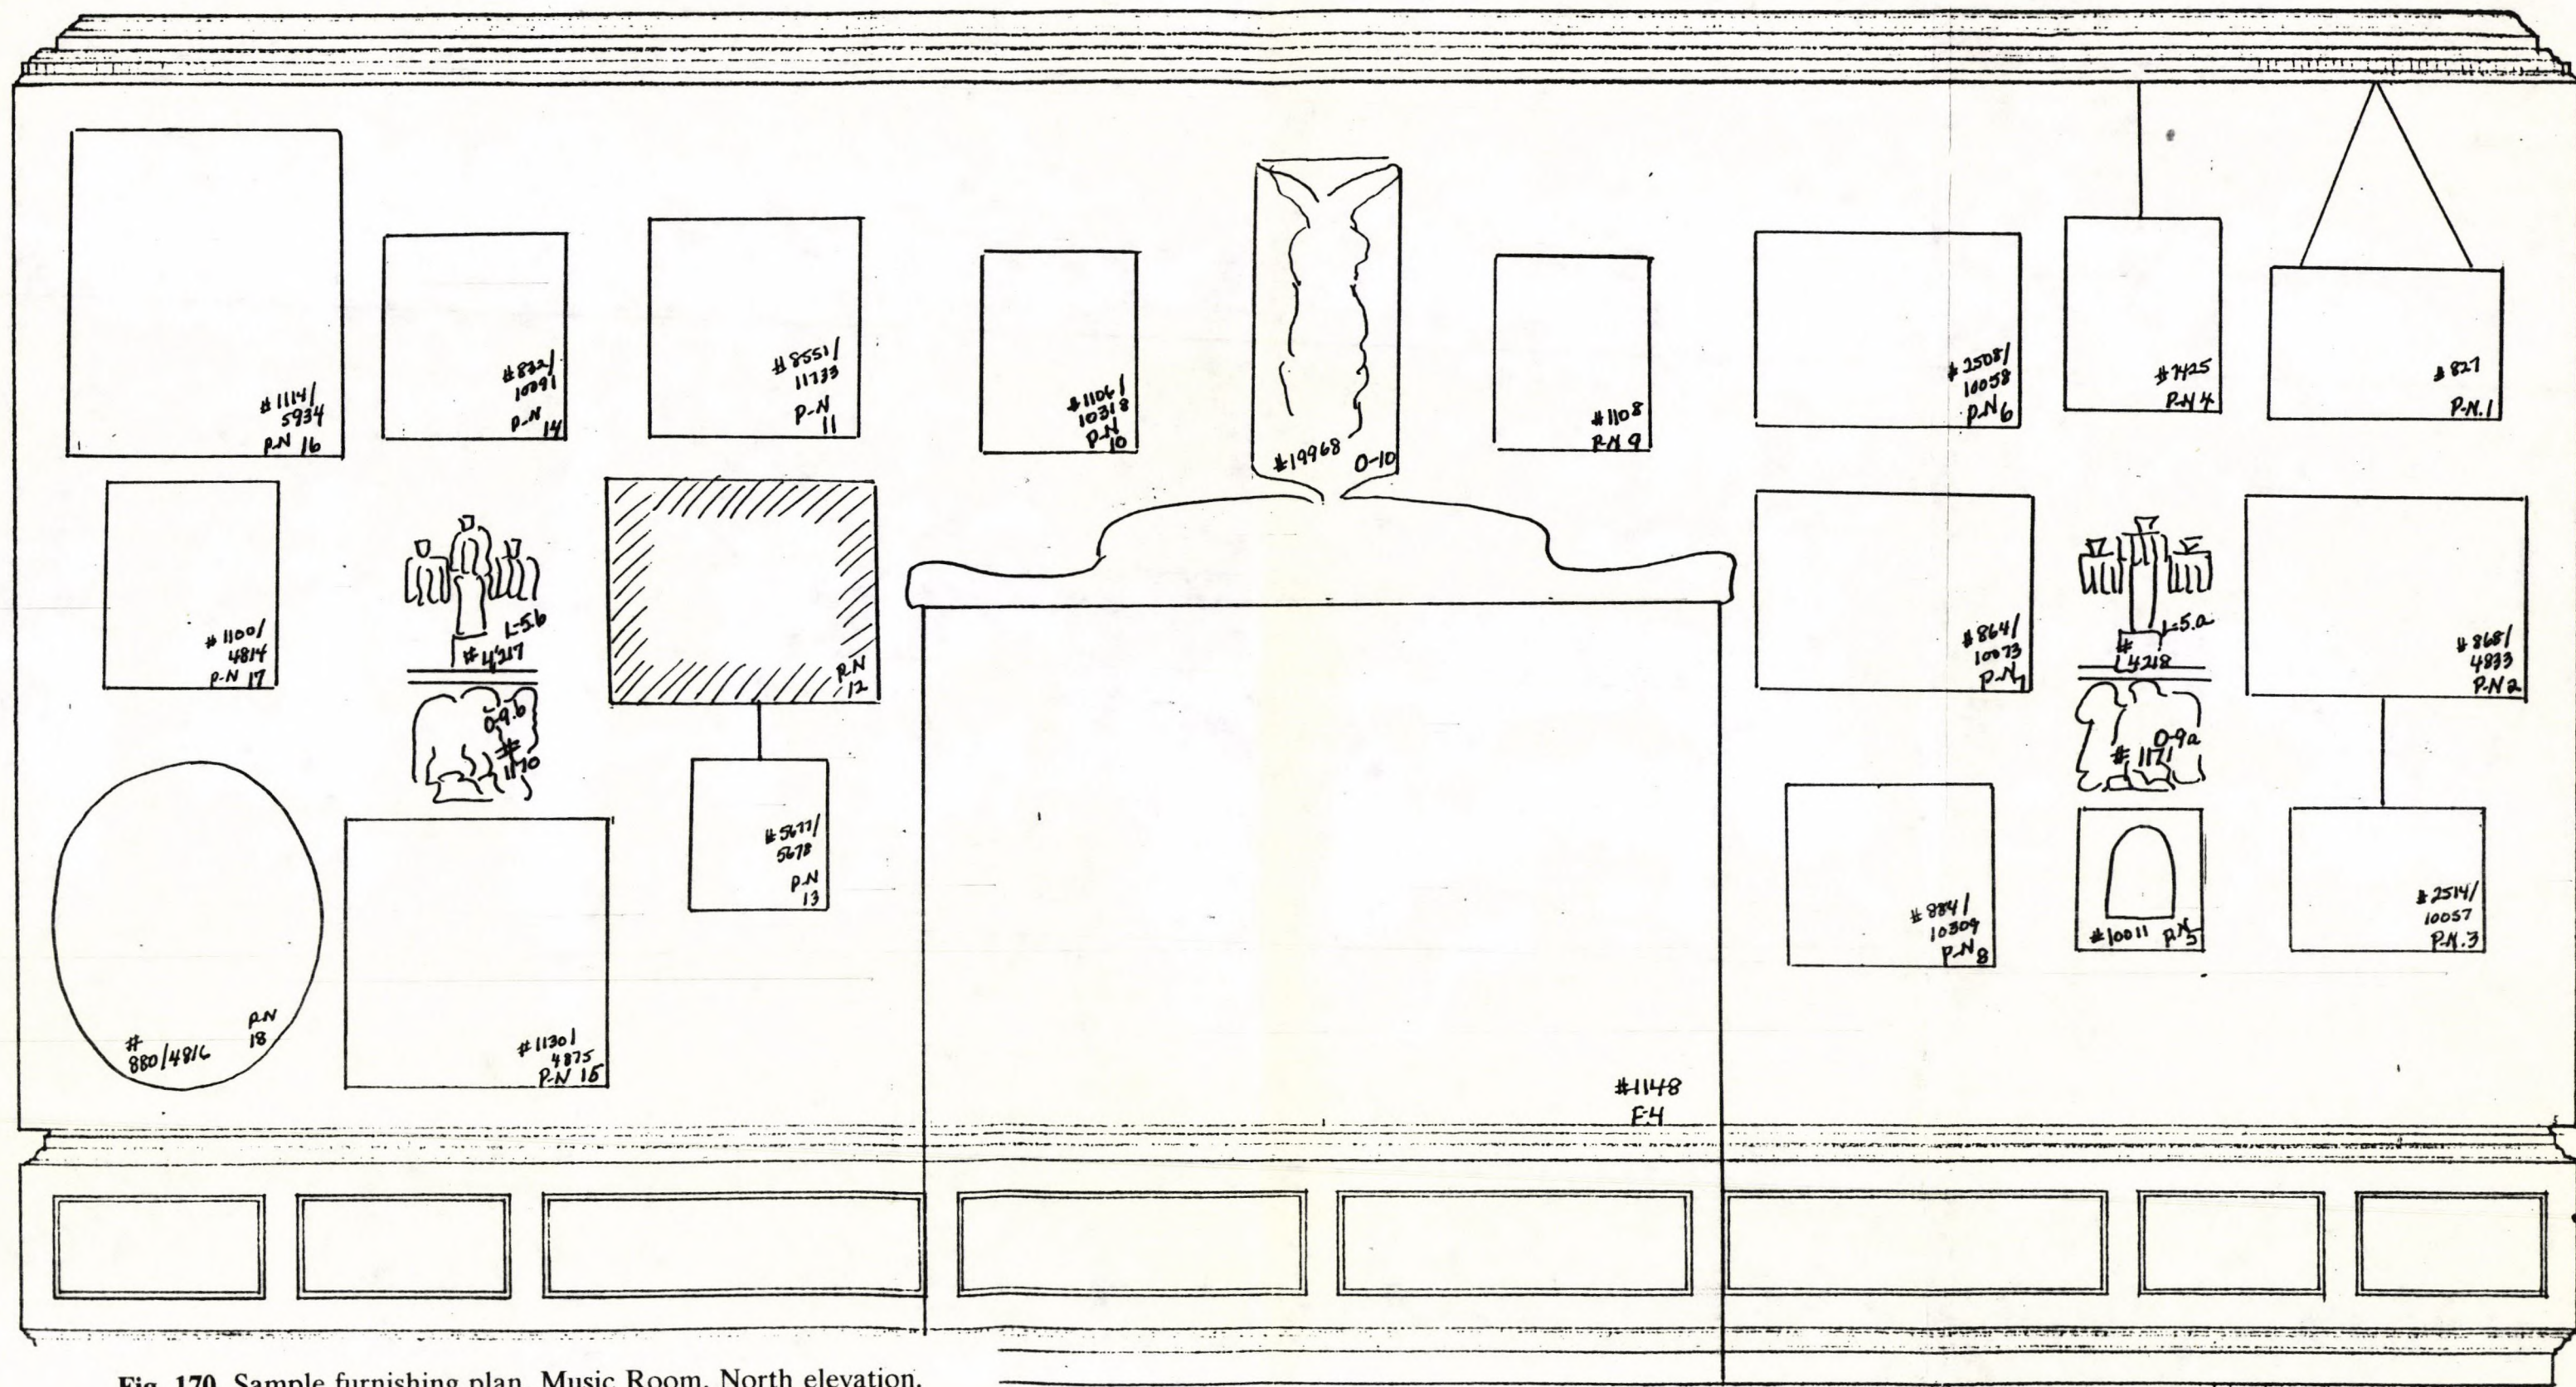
Sample furnishing plan, Music Room, North elevation.
